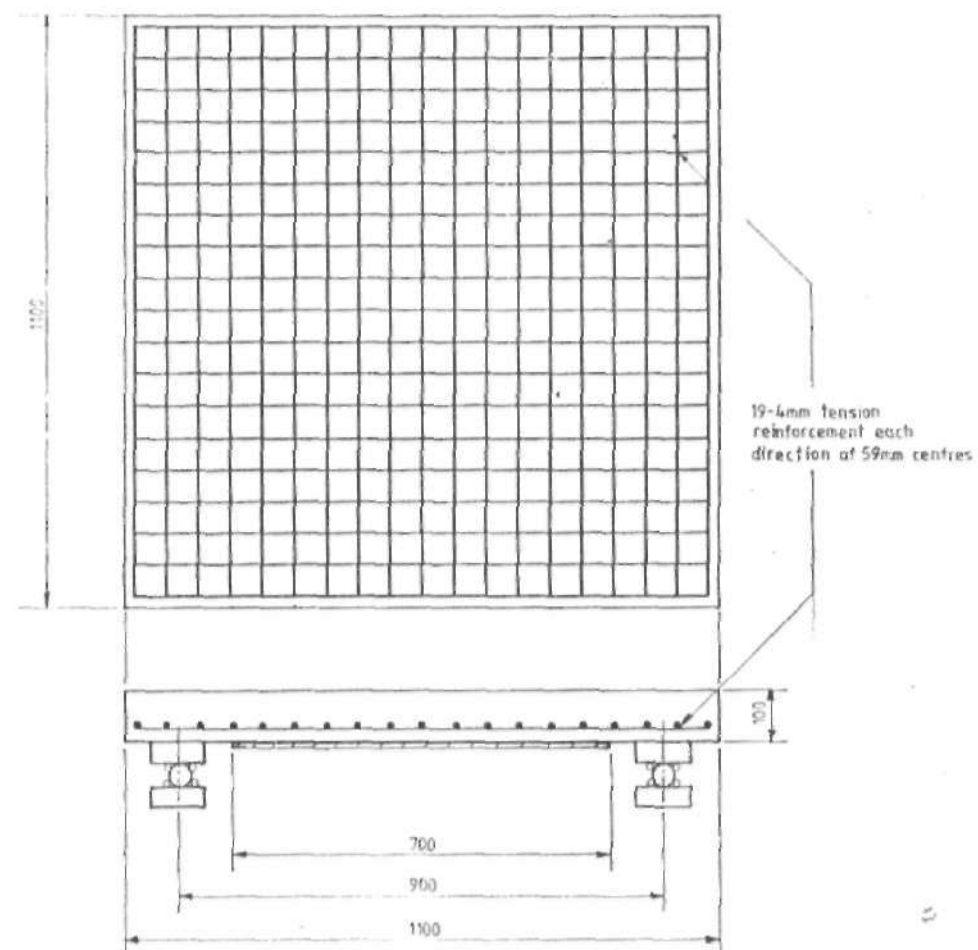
Dimensions of a Typical Test Slab and Reinforcing Details
